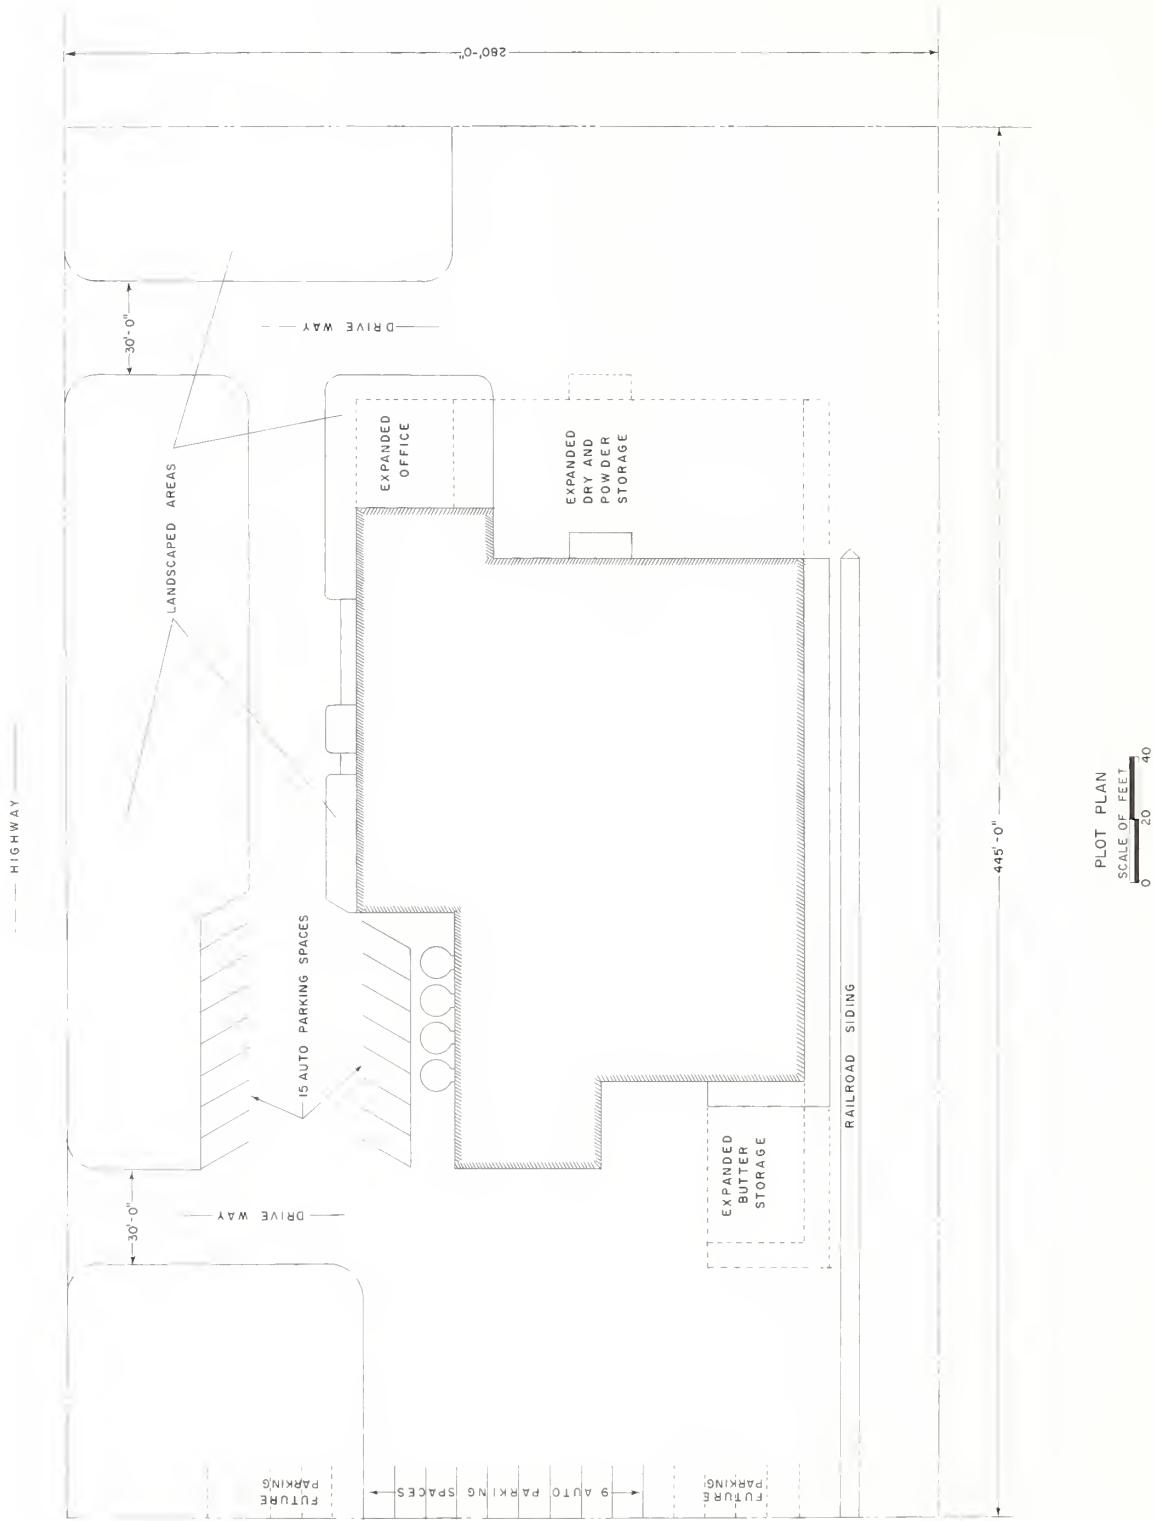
A suggested layout for the site of an automated butter and dried products plant handling 250,000 pounds of milk daily.
